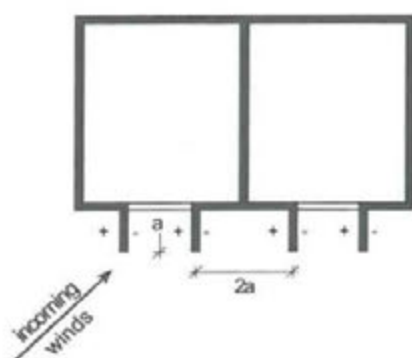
Suggested wing-walls to windows for rooms with one external wall only
